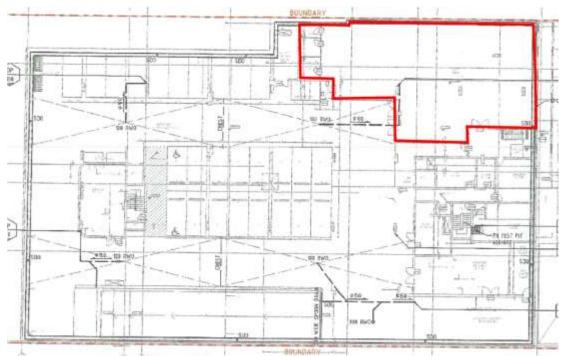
An extract of the basement level one plans approved by Section 4.55(1A) Modification Application no. MOD2018/0202; the area outlined by the red border denotes the area (excluding car parking) that is the subject of this DA.
